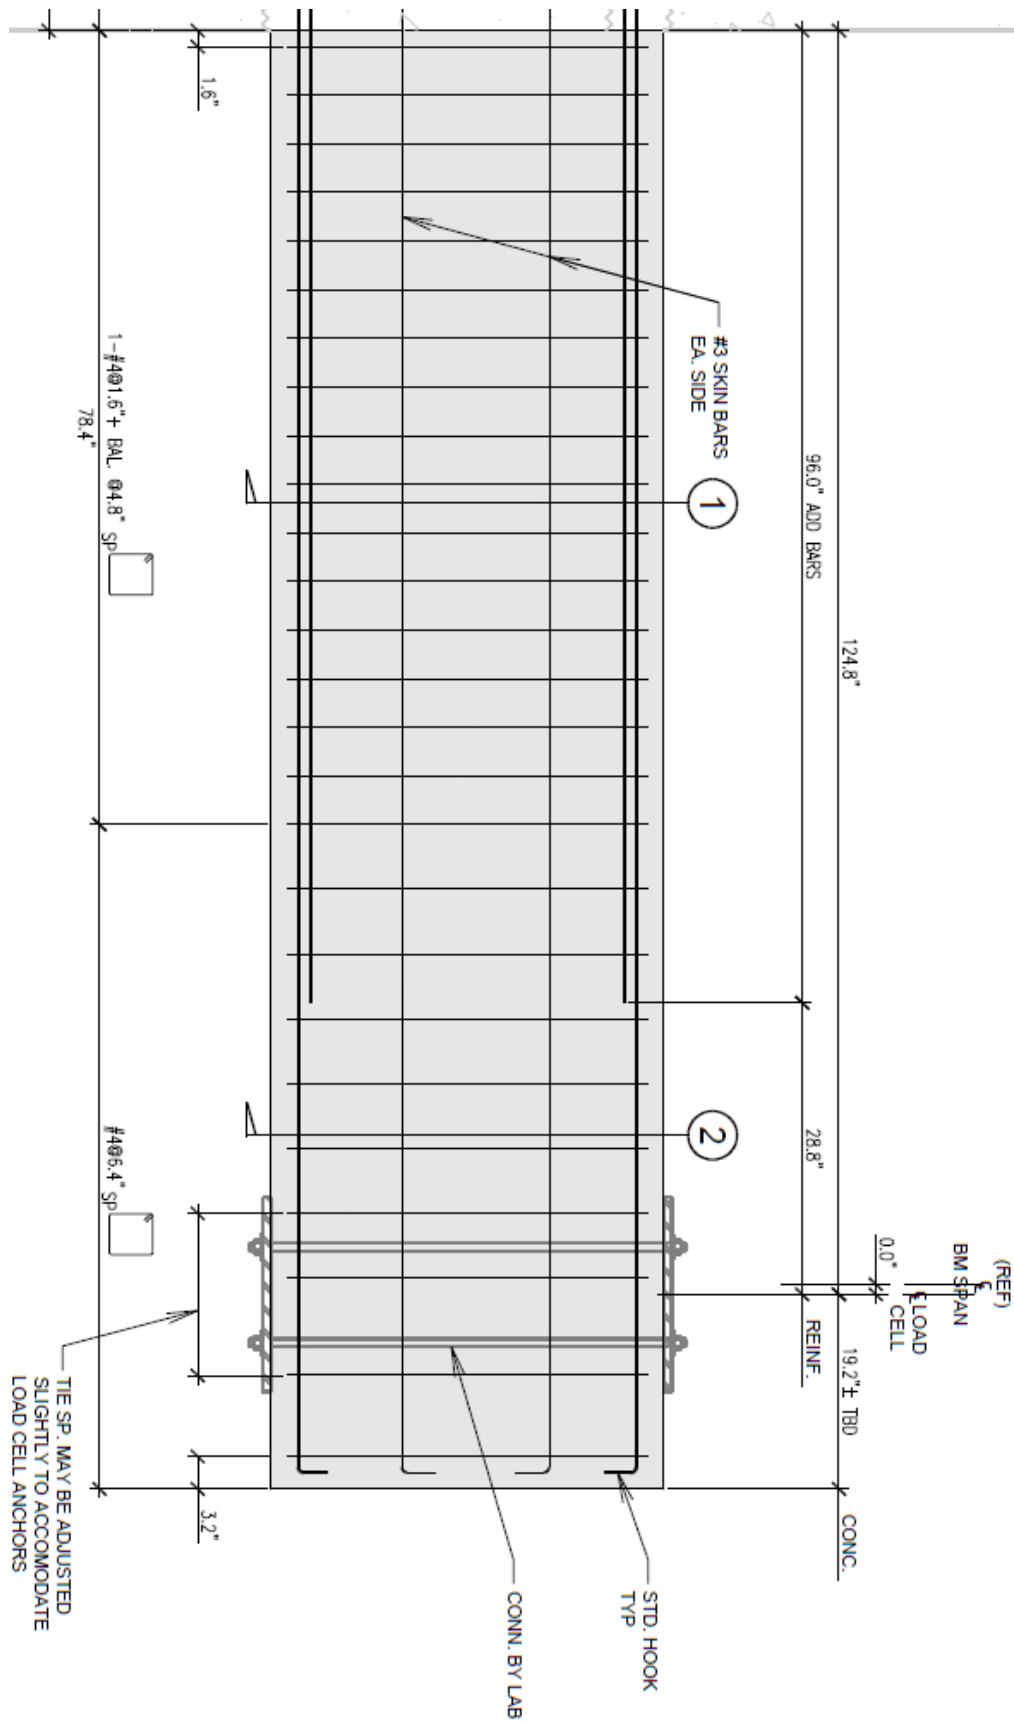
Side elevation of Specimen 7 (Lemnitzer et al., 2013).
